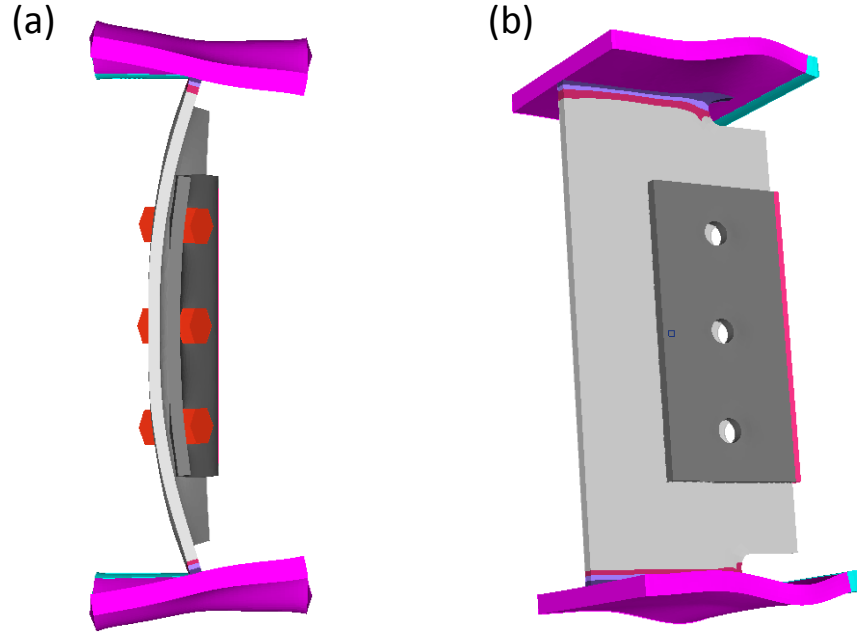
Failure modes of the WUF-B connection in compression: (a) local buckling of beam's cross-section, (b) shear fracture of bolts.
